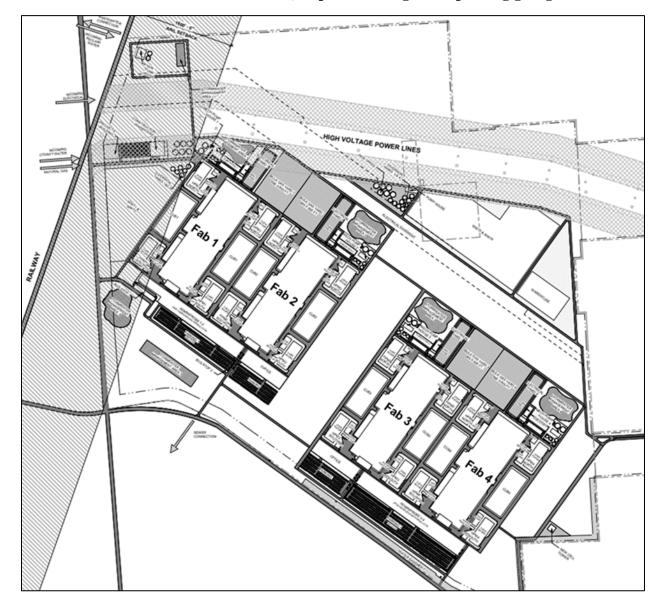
Site Layout Alternative 5 (Fabs 3-4 shifted to southeast; requires underground parking garages)
